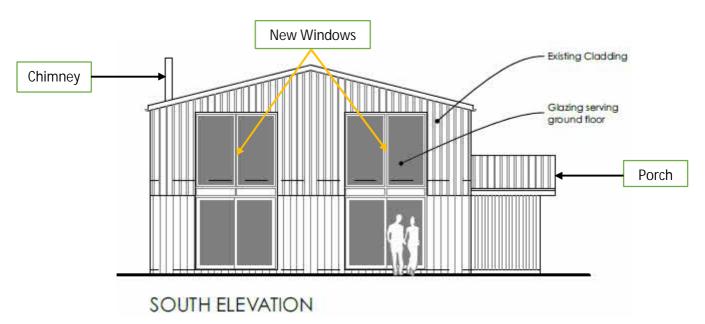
Excerpt from Proposed Planning Drawing Plans and Elevations, drawing number 21.0458 PL01 by Howes Designs
